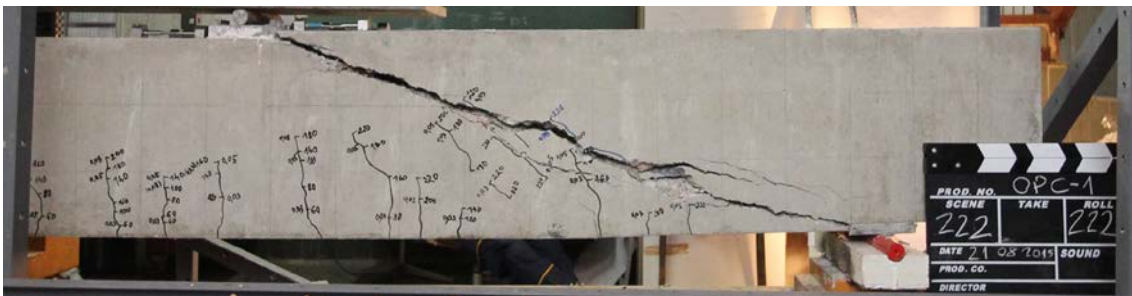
OPC-1 beam failure crack pattern
